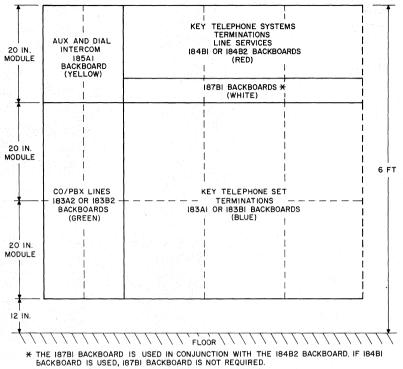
Typical Apparatus Closet Arrangement Using 88-Type Wiring Blocks
